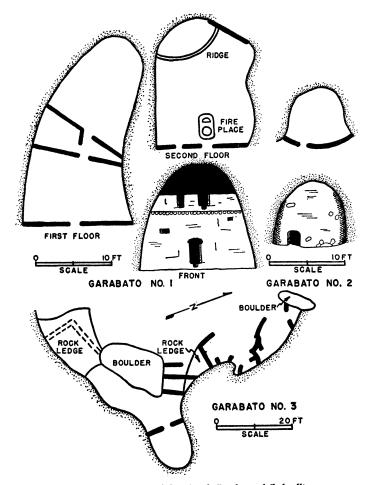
Sketch plans and façade of Garabato cliff dwellings.
